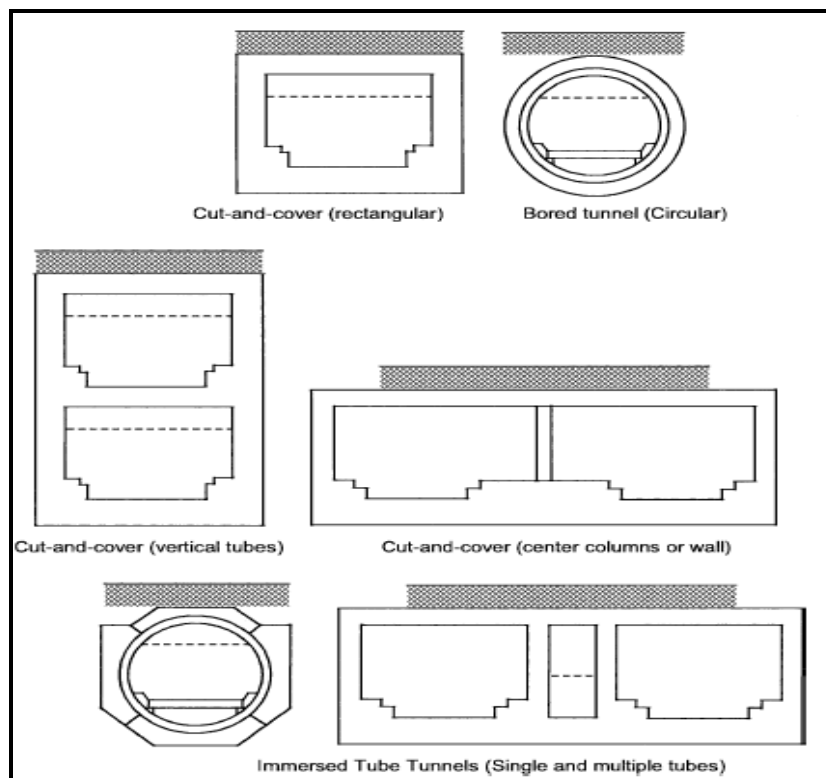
Cross section of tunnels (after Power et al., 1996).
